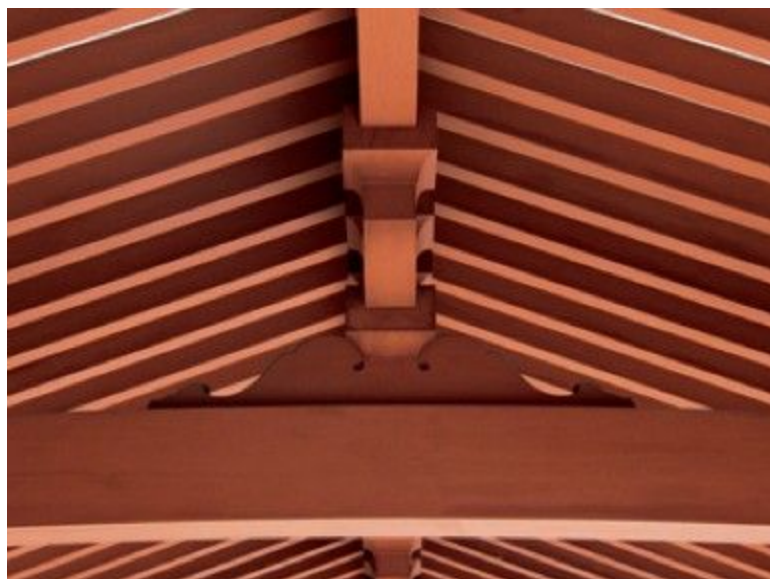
Detail of the beams and rafters of the Sanzō-in cloister, or surrounding corridor.
